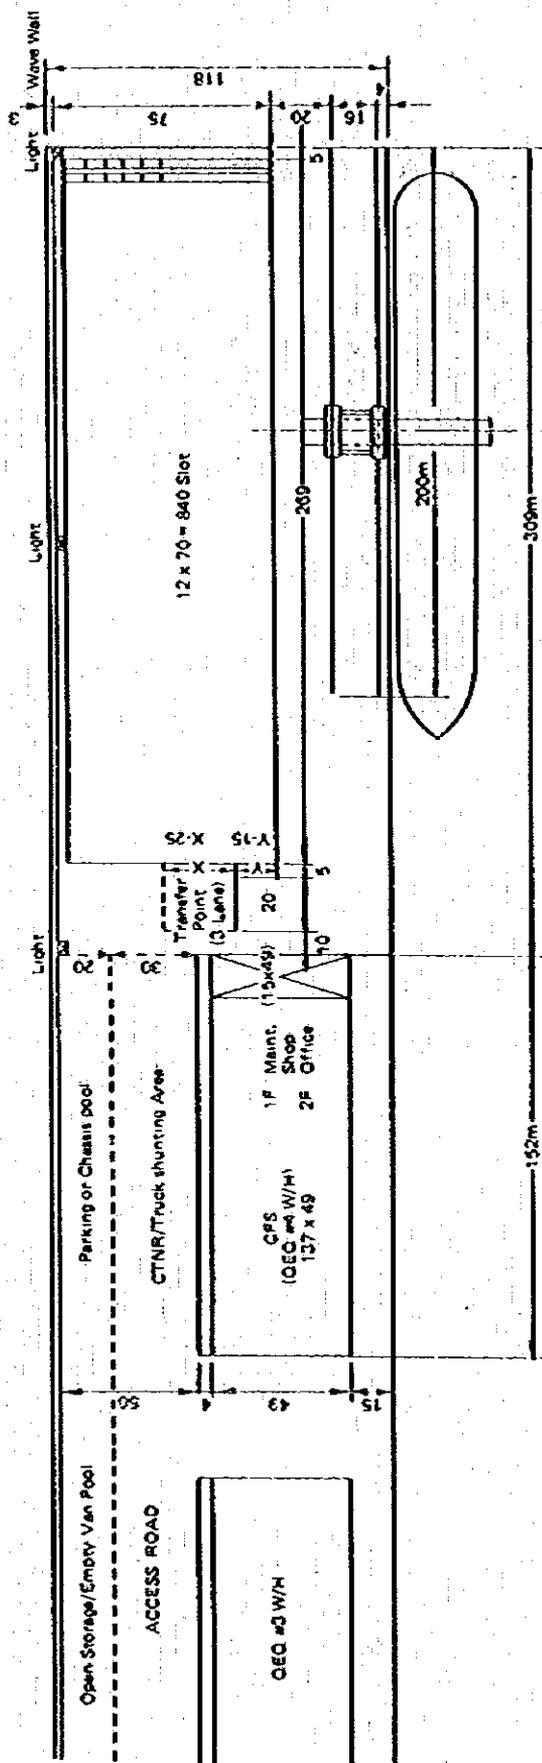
Layout of QEQ #5 Container Terminal (Transfer Crane System)
